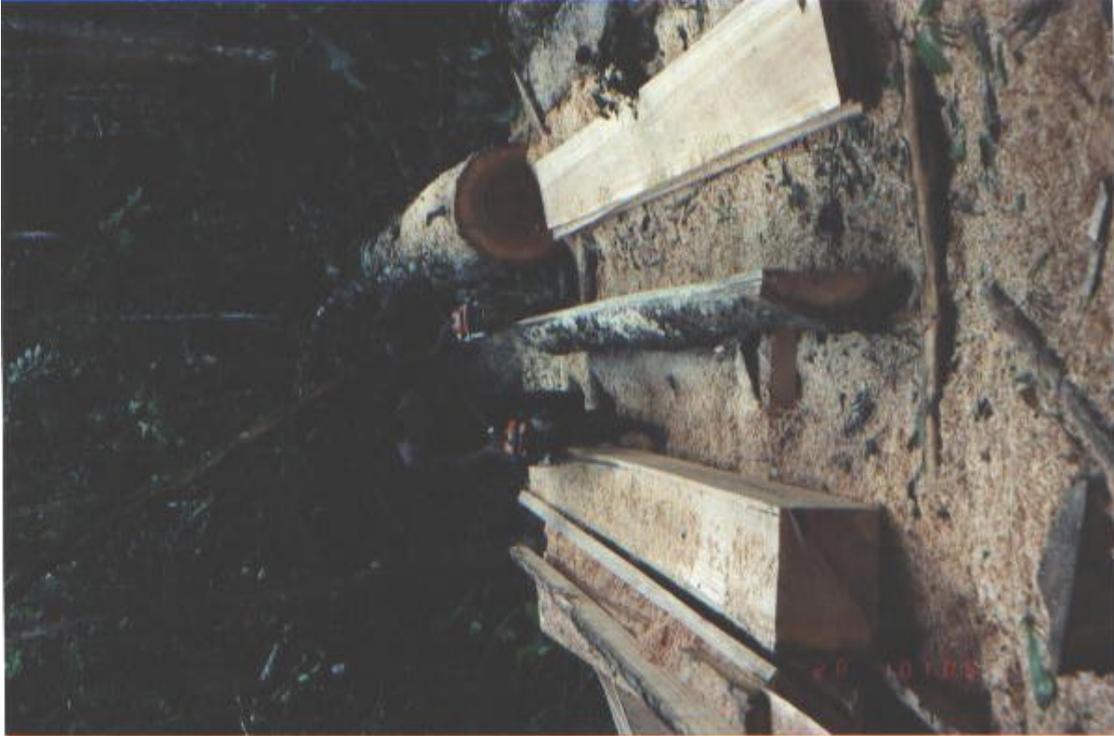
Constructing a New Narrow Sluiceway for Roy Bacchus at Jubilee Creek
